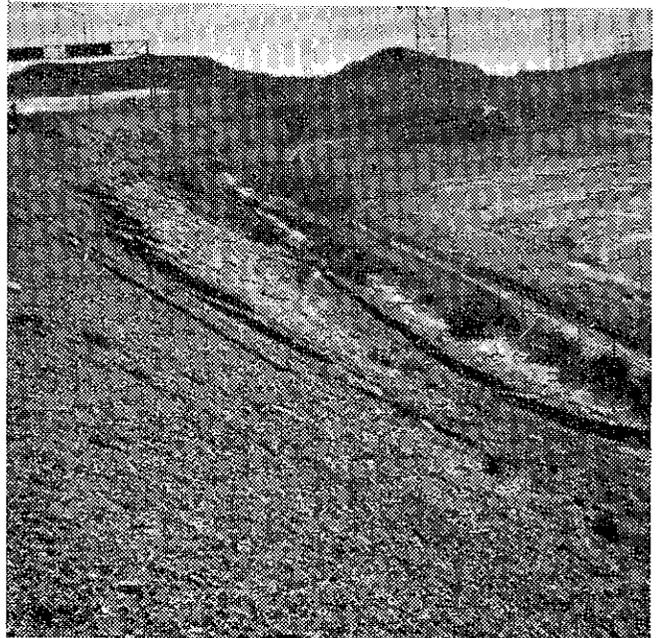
Looking south at westerly slope of embankment. Note cracks and lateral movement in slope.
